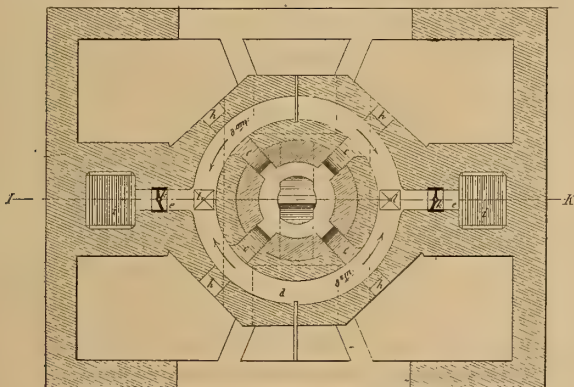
SECTION PLAN OF THE STEINMANN KILN
